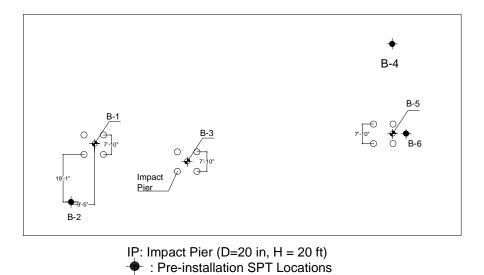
Jacksonville, FL: Piers and SPT locations plan layout
